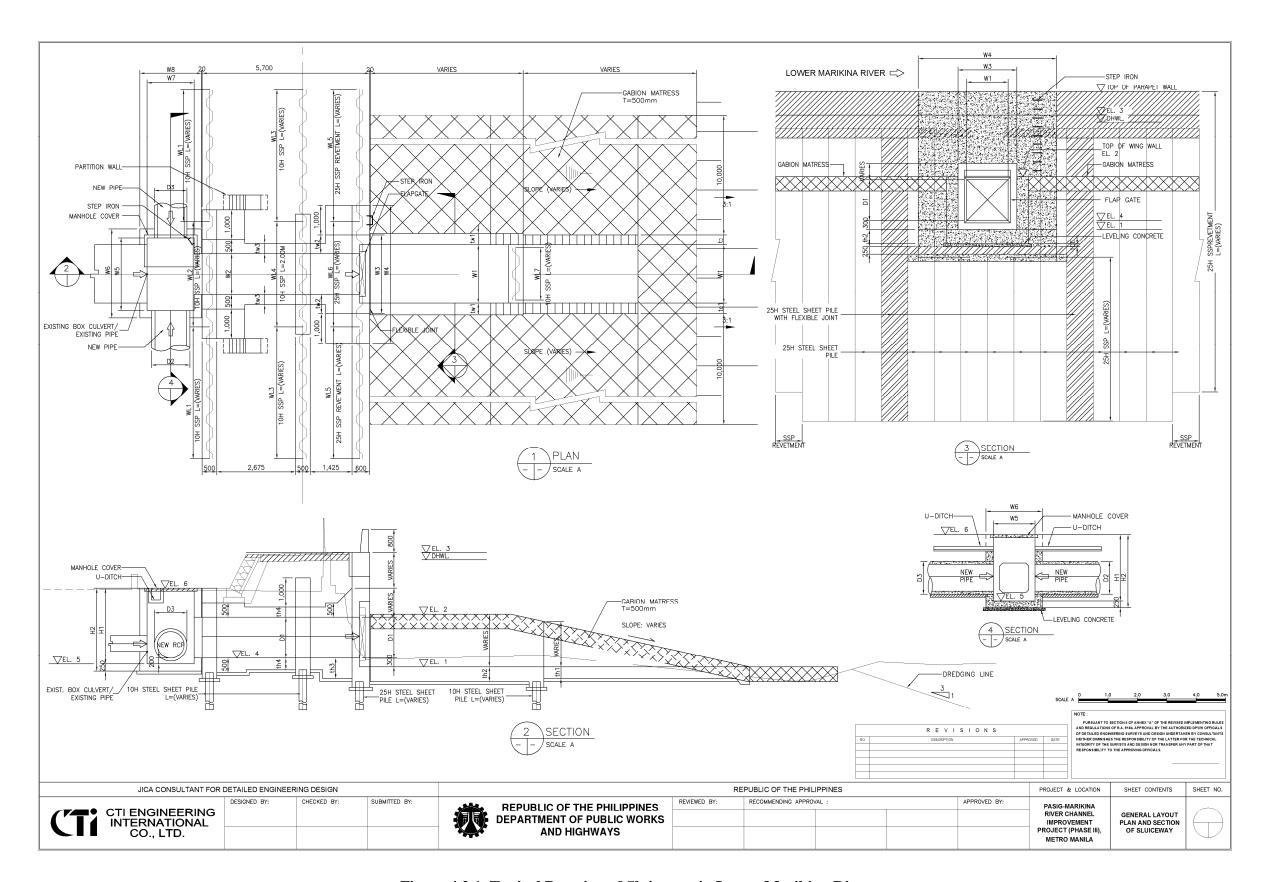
1 Typical Drawing of Sluiceway in Lower Marikina River
